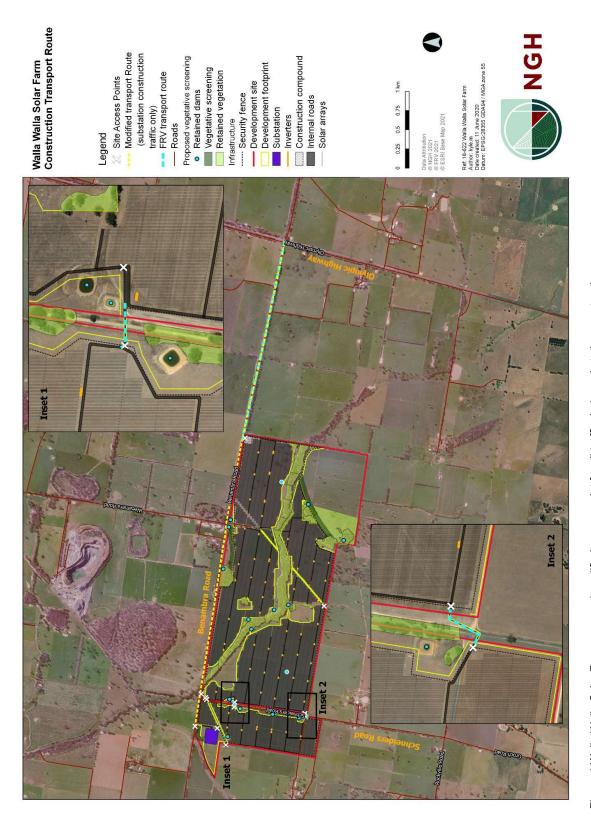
Walla Walla Solar Farm proposed modified access point for all traffic during substation construction
